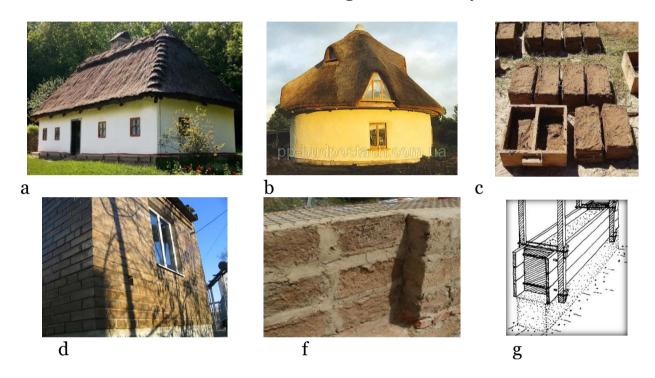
Technologies of construction of Ukrainian houses made of soil: a - Ukrainian house; b - modern building; c - clay soil blocks with straw (adam); d, f house and masonry; g - erection of the soil-molded house
